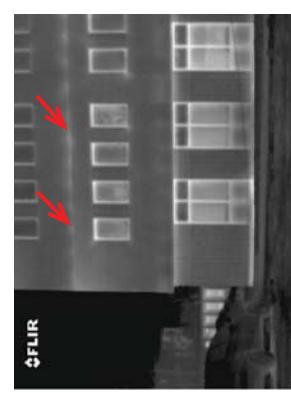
Conductive heat loss at masonry structural shelf angle support (building under positive pressure).
